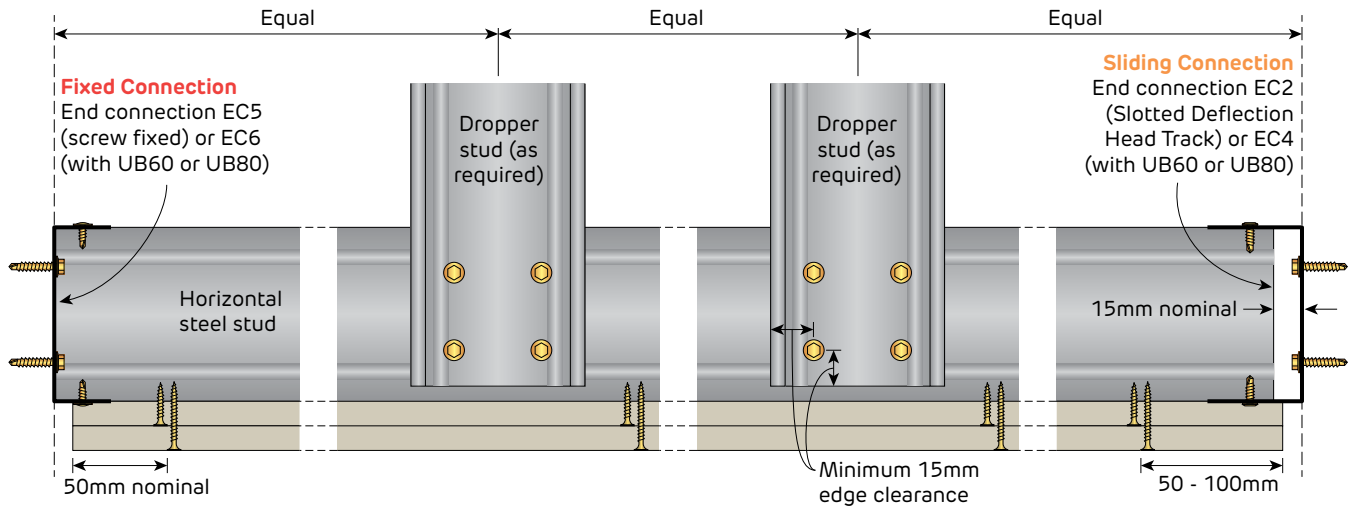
Stud Ceiling Type A2 - Fixed / Sliding
